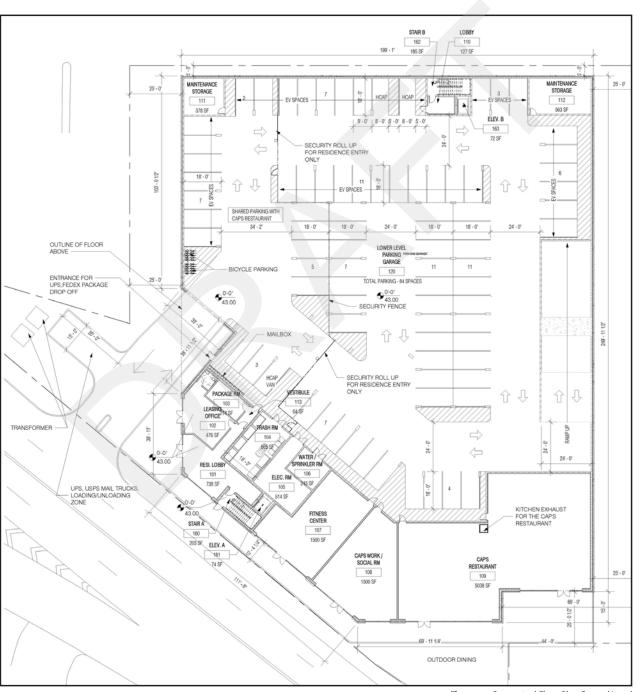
Conceptual Floor Plan Ground Level Courtesy of Mistry Design BOROUGH
